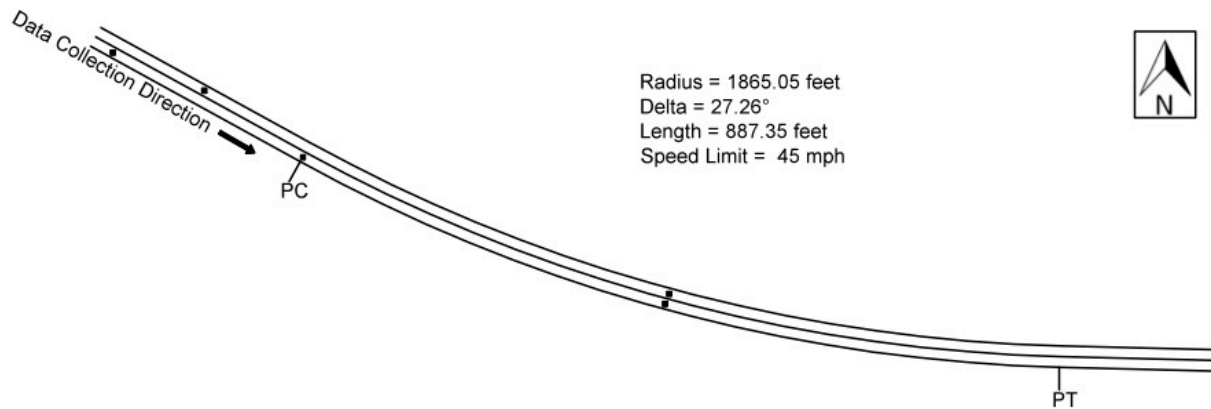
Diagram. Geometric layout of southbound Shinarump Road (not to scale).
